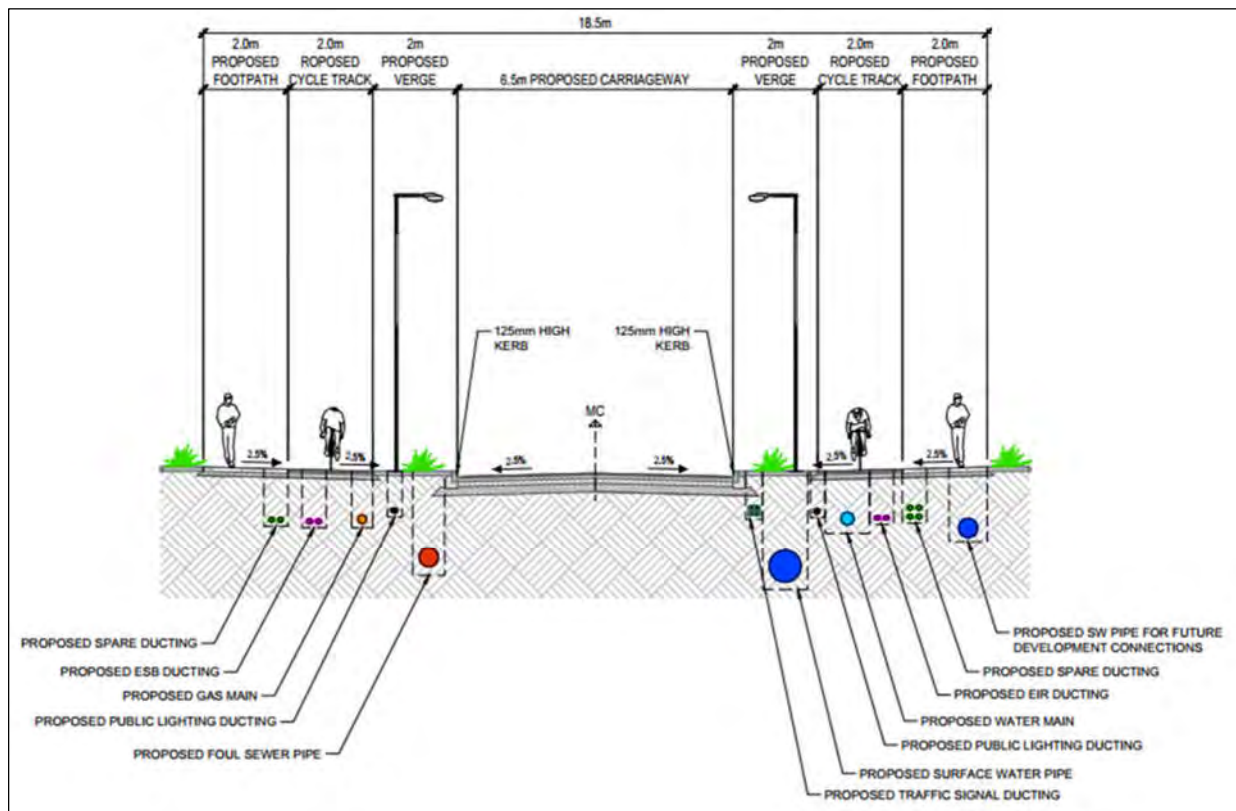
Typical Cross-Section of Northern Services Corridor Link Road.
